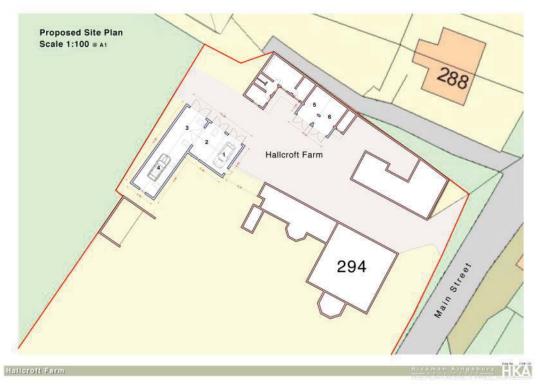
Proposed site layout (supplied by client, Not to Scale)
